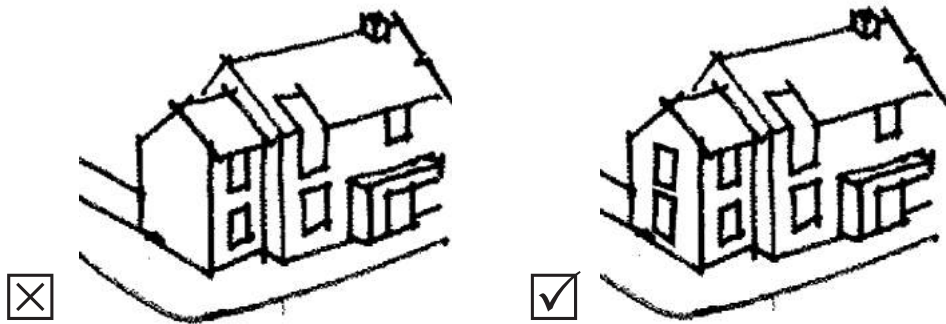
Extensions where side elevations face the street should incorporate windows to provide passive surveillance
